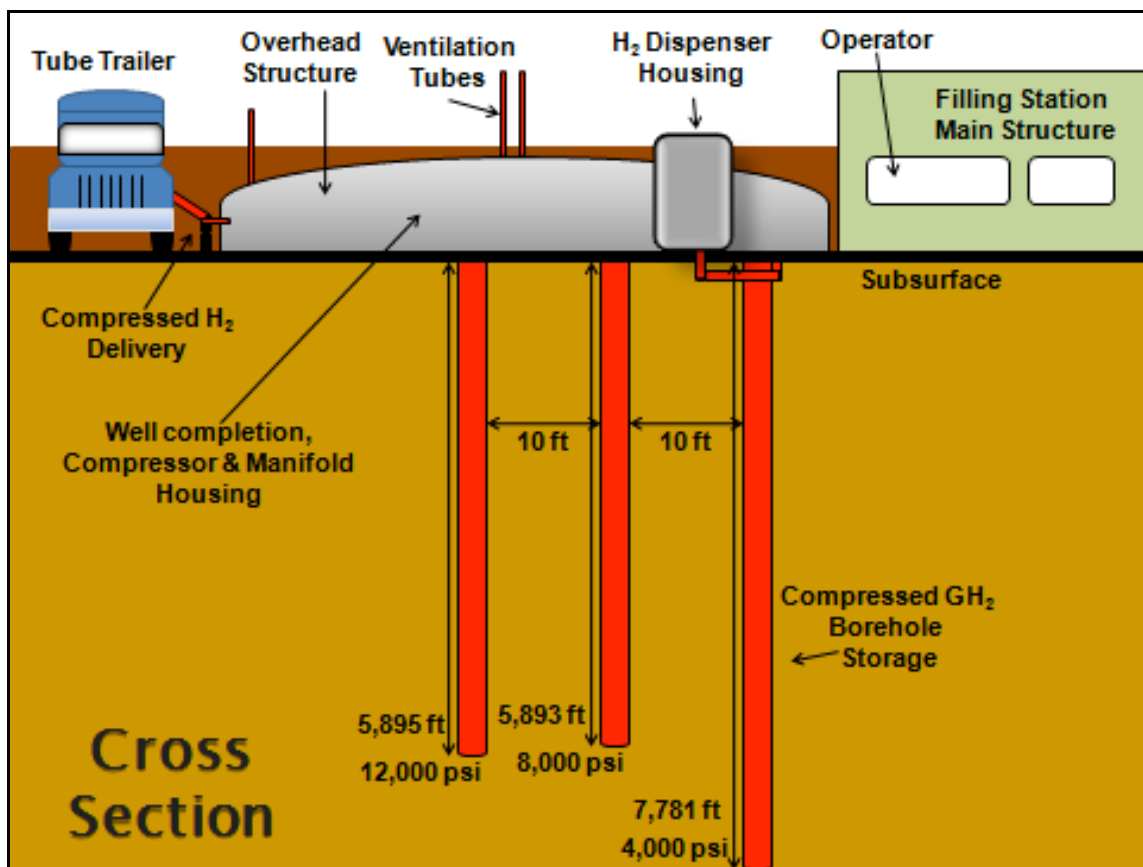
Profile view of H₂ filling station & underground borehole storage apparatus.
